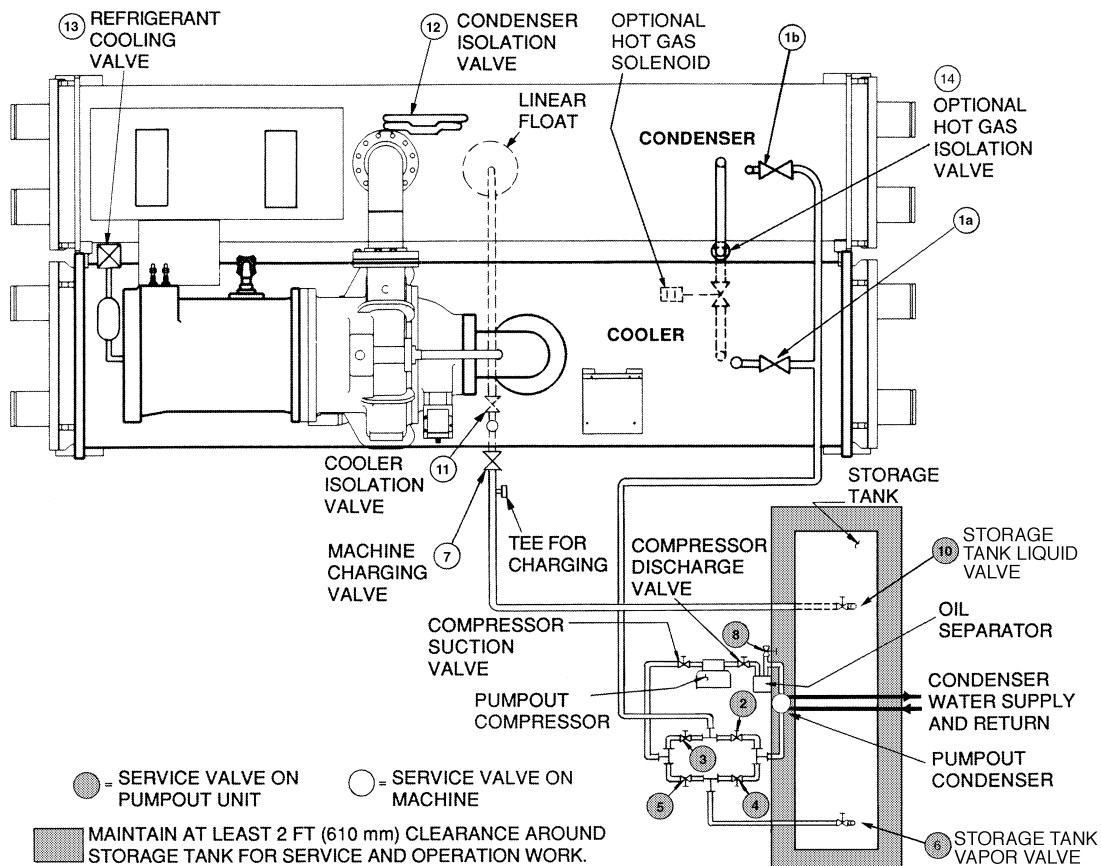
Typical Optional Pumpout System Piping Schematic with Storage Tank
